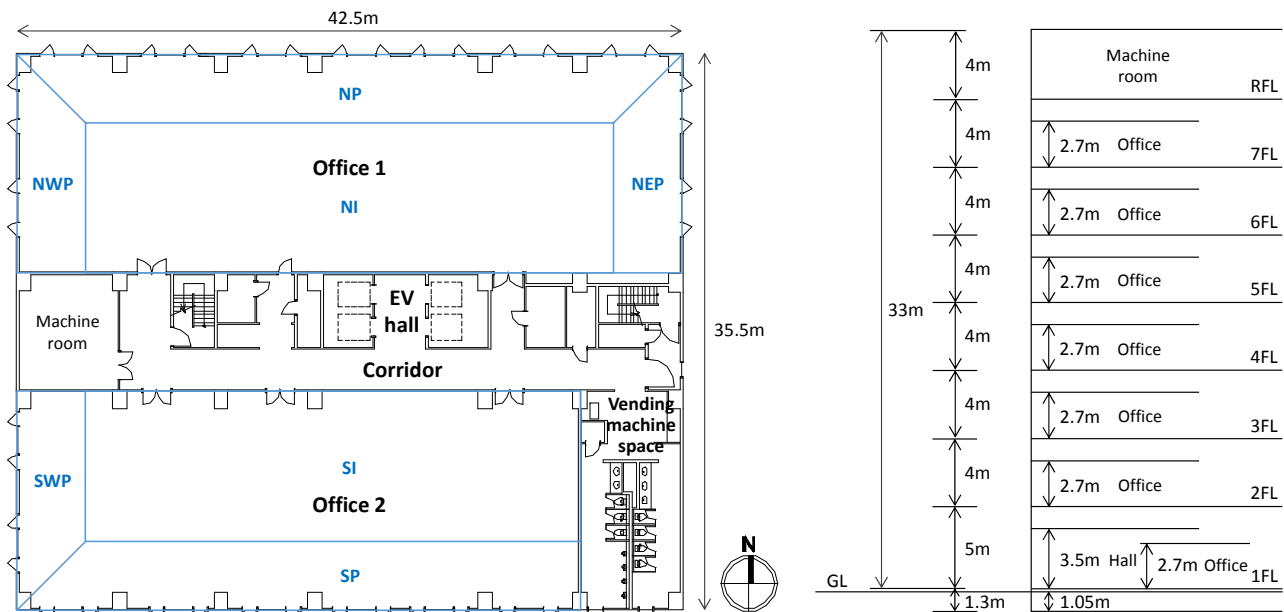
Standard floor plan (left) and floor configuration (right) of office building
